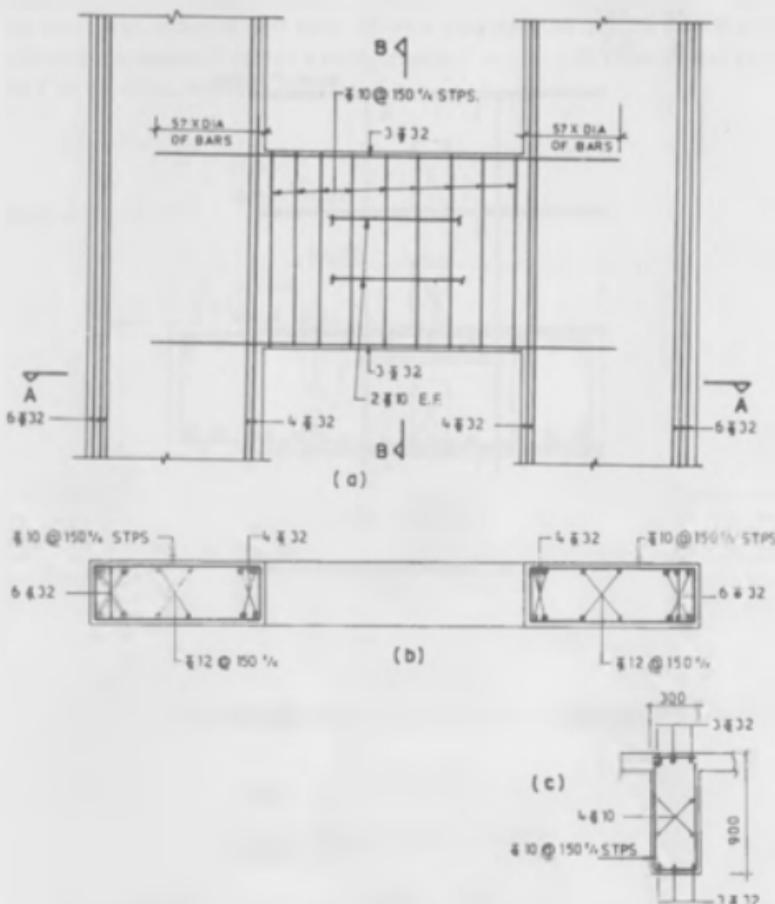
Steel arrangement in coupled shear wall. (a) Elevation of wall; (b) Section A-A of coupled shear wall; (c) Section B-B.
